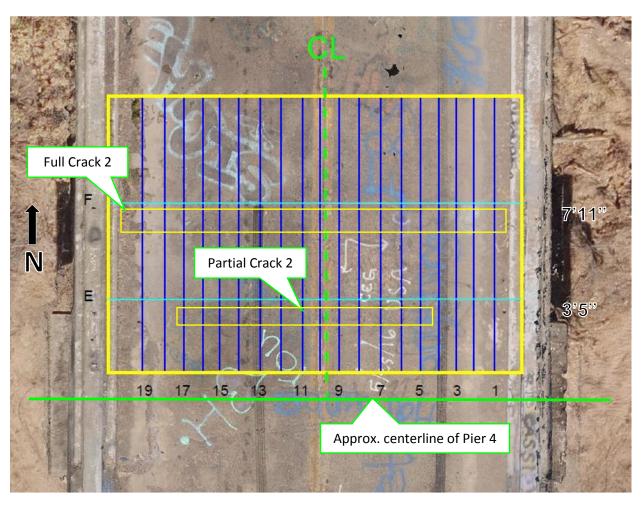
Approximate GPR scan lines at Pier 4/Abutment 5 bridge deck
